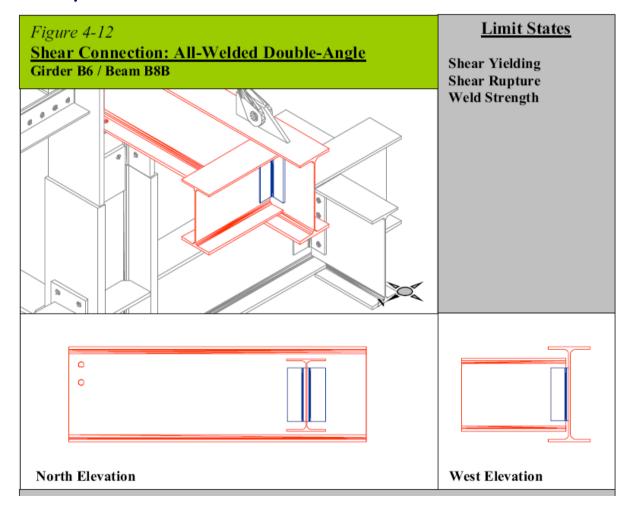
Shear Connection: All-welded double-angle Girder B6 / Beam B8B
